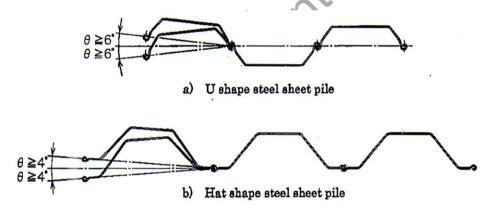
Coupling mating angle of U shape and hat shape steel sheet pile
